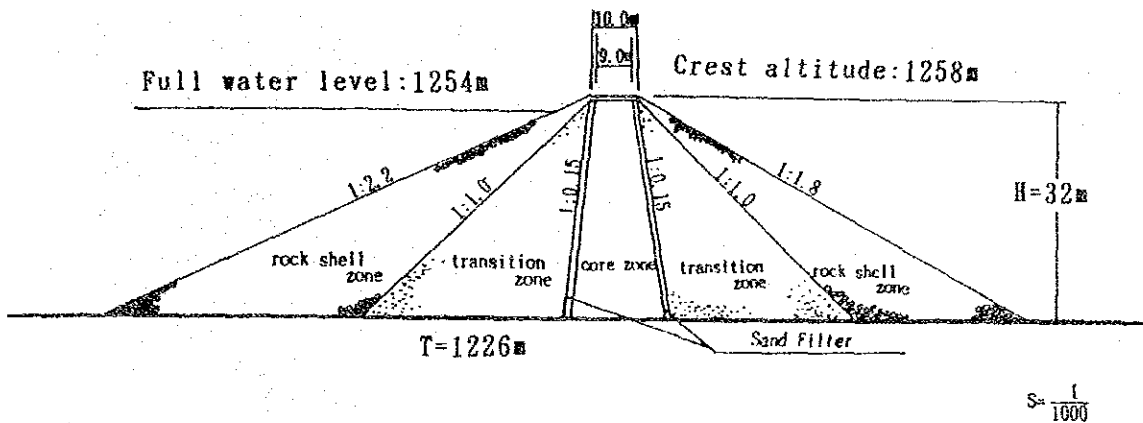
Standard Section of the Dam at the Rio Grande
